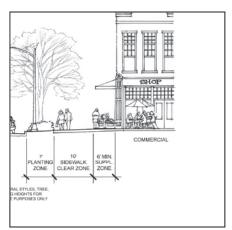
Non-residential streetscape south of DeKalb Avenue
